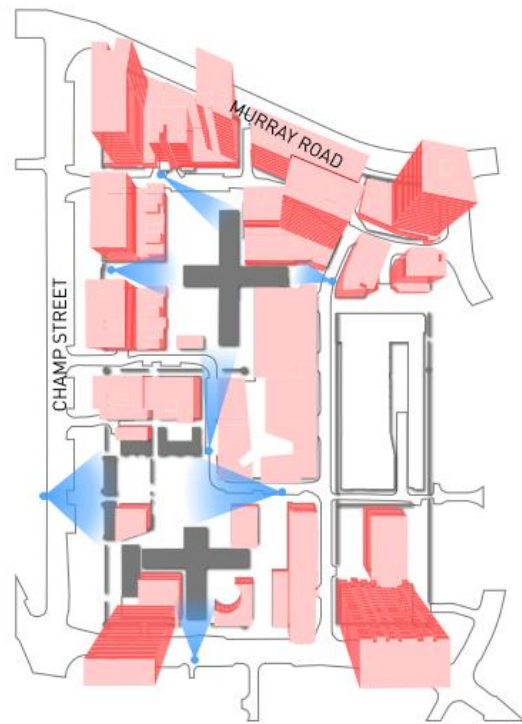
Arrangement of Buildings having regard to Key Views, External Amenity and the Public Realm
